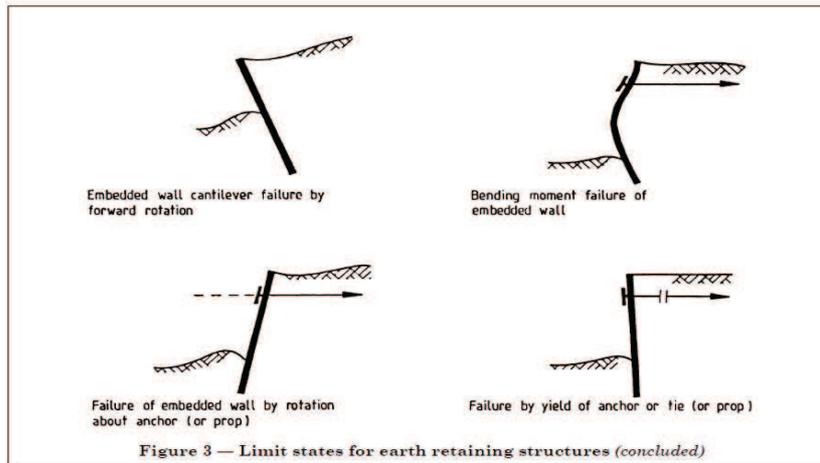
Retaining wall limit state: extract 3 from BS 8002:1994 [4]
